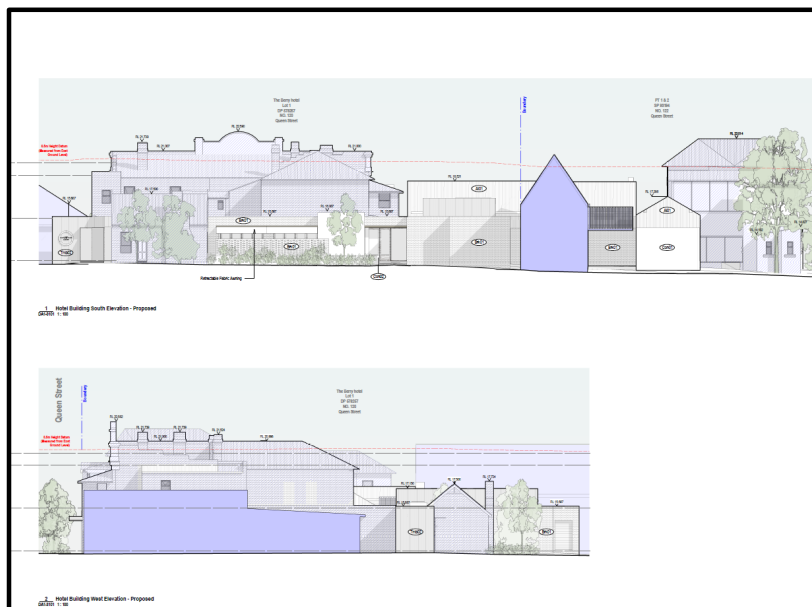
Hotel Elevations (South and West) (Source: H&E Architects)
